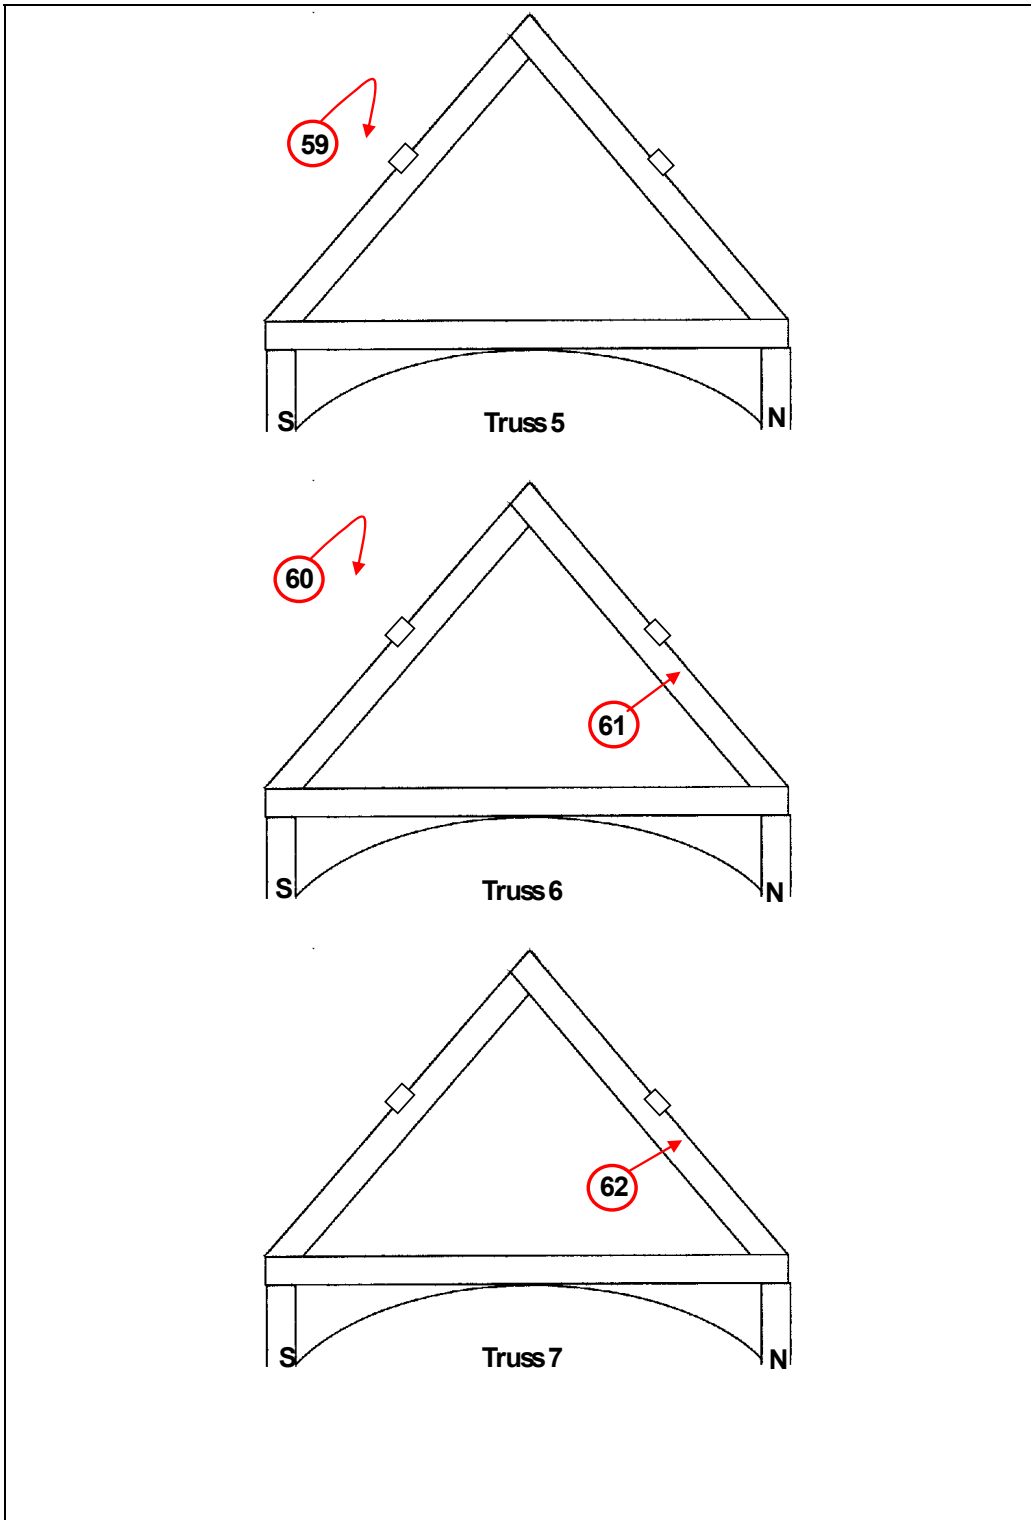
Trusses 5–7 of the north aisle roof to show sampled timbers
